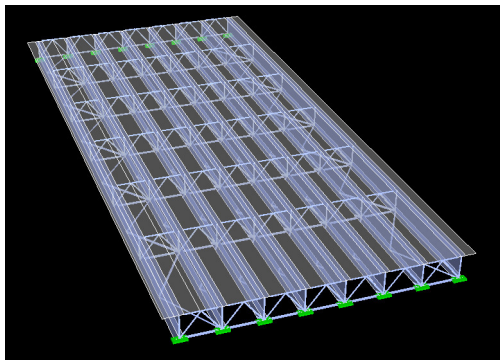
Numerical model Span#1 Southbound Structure using beam and plane elements.
